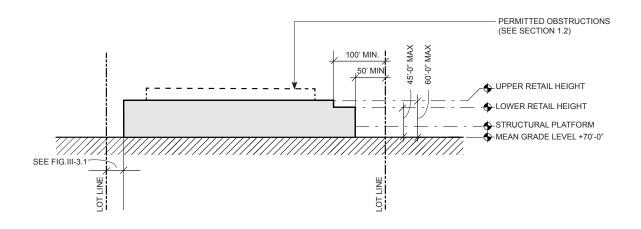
BUILDING HEIGHTS - RETAIL SITE A; OFFICE
